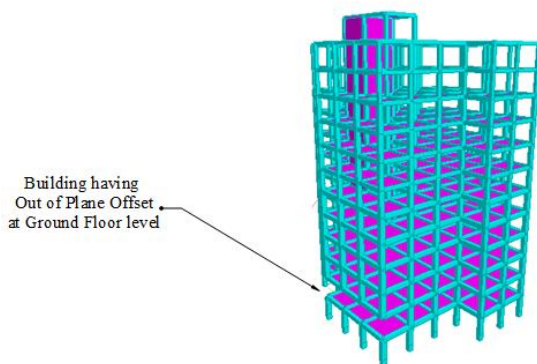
Model Possibility 1.1 - General Structure with out of plane offset provided at ground floor level
